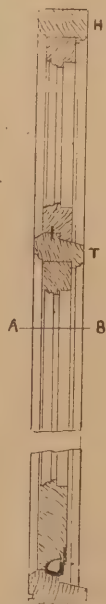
SECTION ON C-D. A FRENCH CASEMENT.
